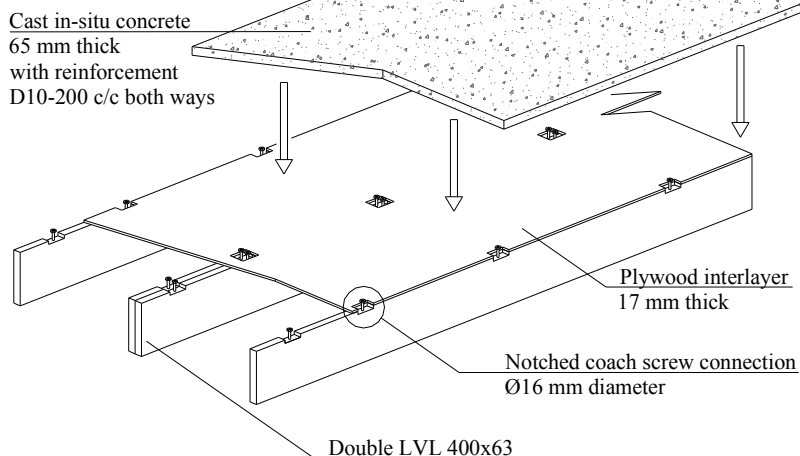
The Composite Floor System Under Study (Yeoh, 2009)
